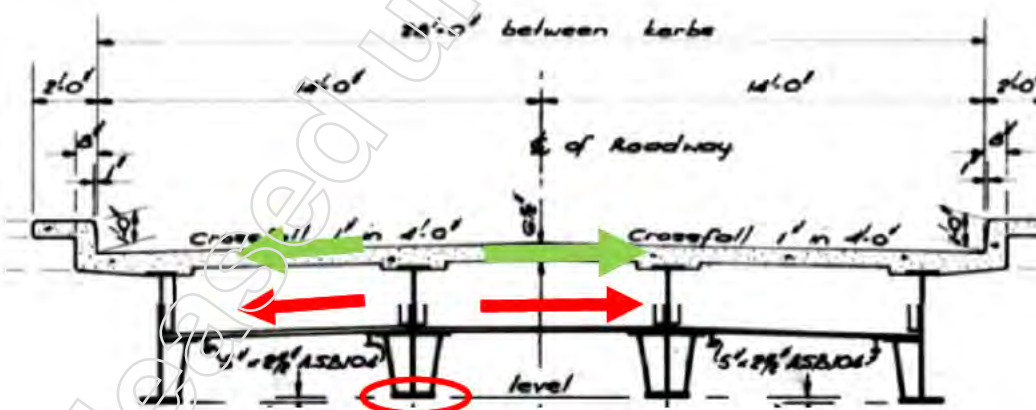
Example load distribution through cross girders and deck slab from middle girder fracture.
